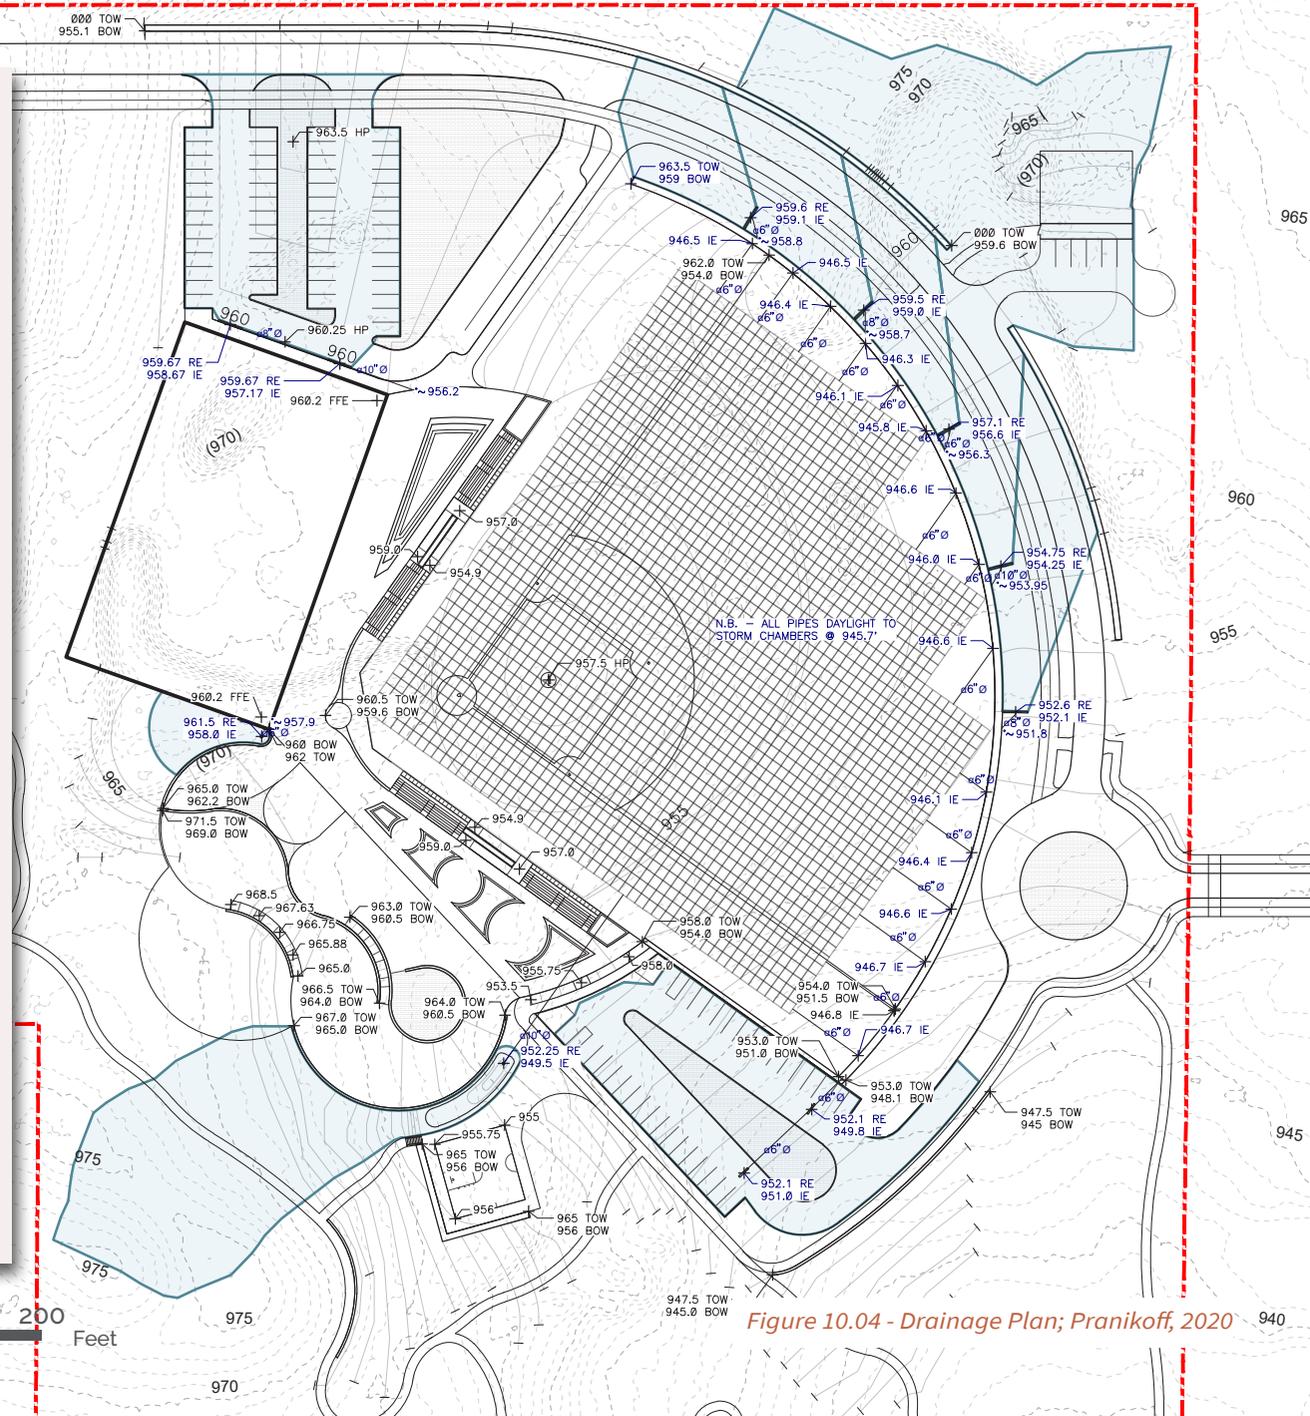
Drainage Plan; Pranicoff, 2020
